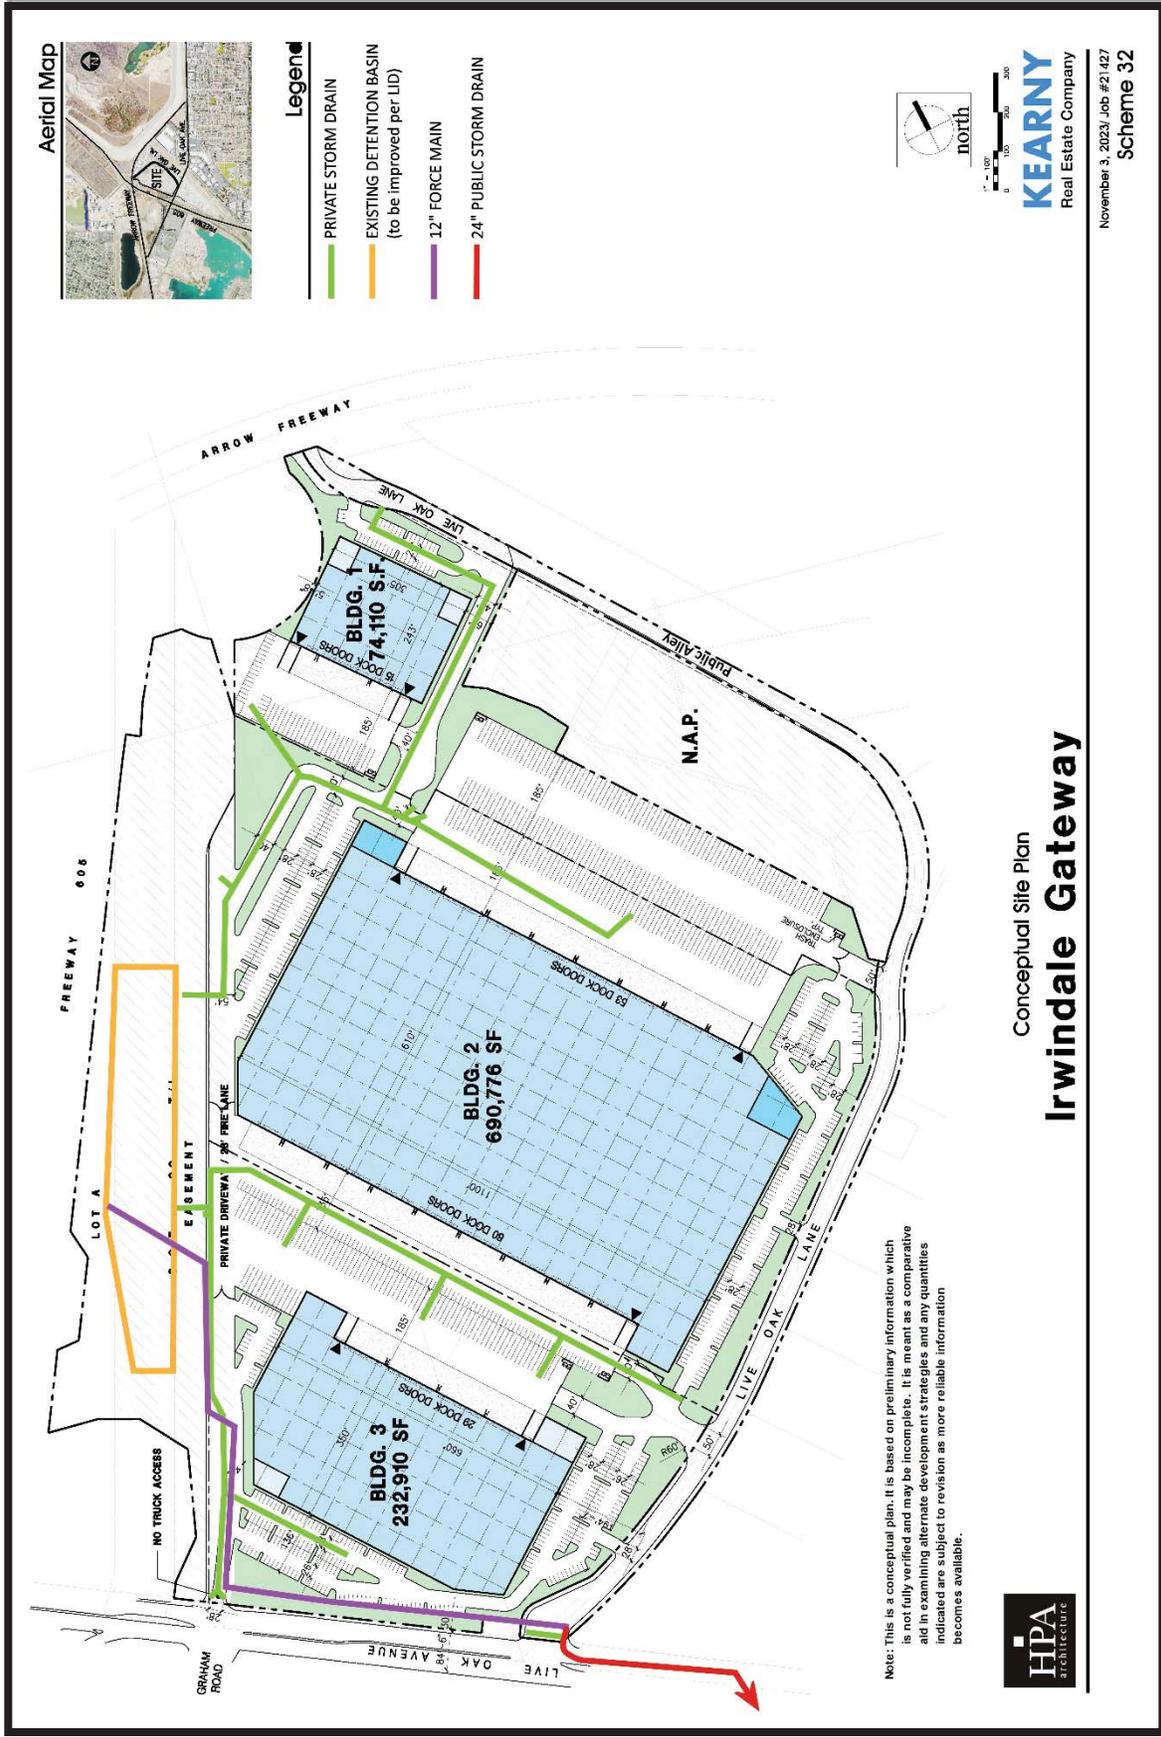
CONCEPTUAL STORM WATER MANAGEMENT PLAN
